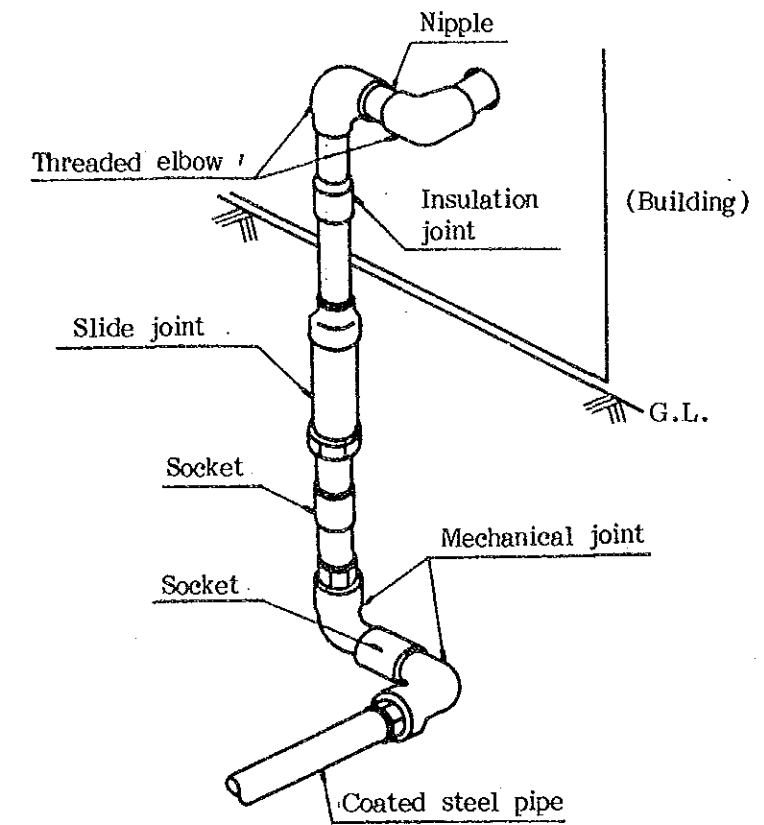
EXAMPLE OF PIPING WITH HIGH FLEXIBILITY
